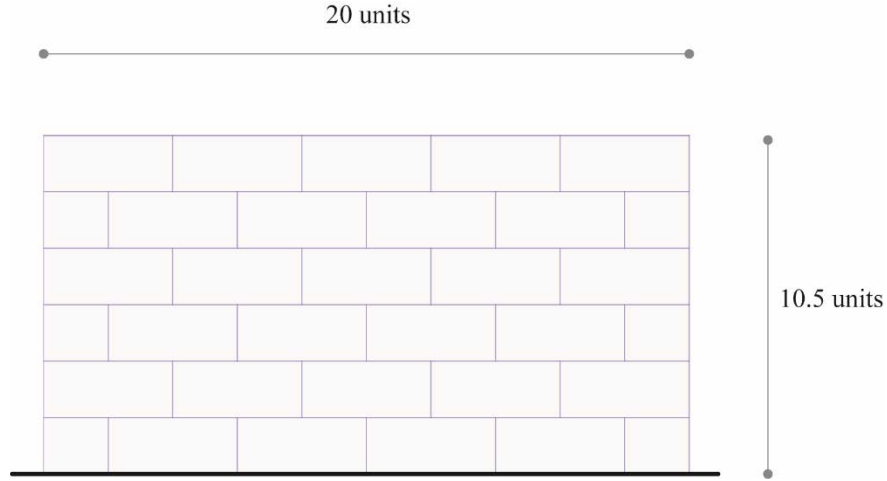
Geometric configuration of the benchmark masonry wall subjected to in-plane horizontal loading [20].
